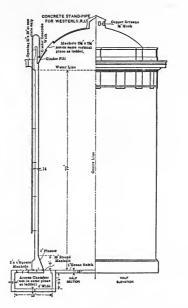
Reinforced concrete stand pipe, Westerly, R. I.
